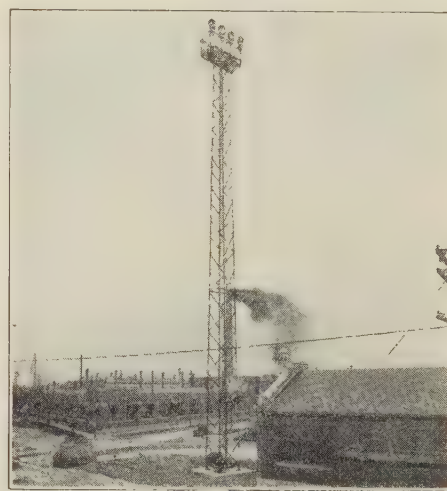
A 110-FT. FLOODLIGHTING TOWER
